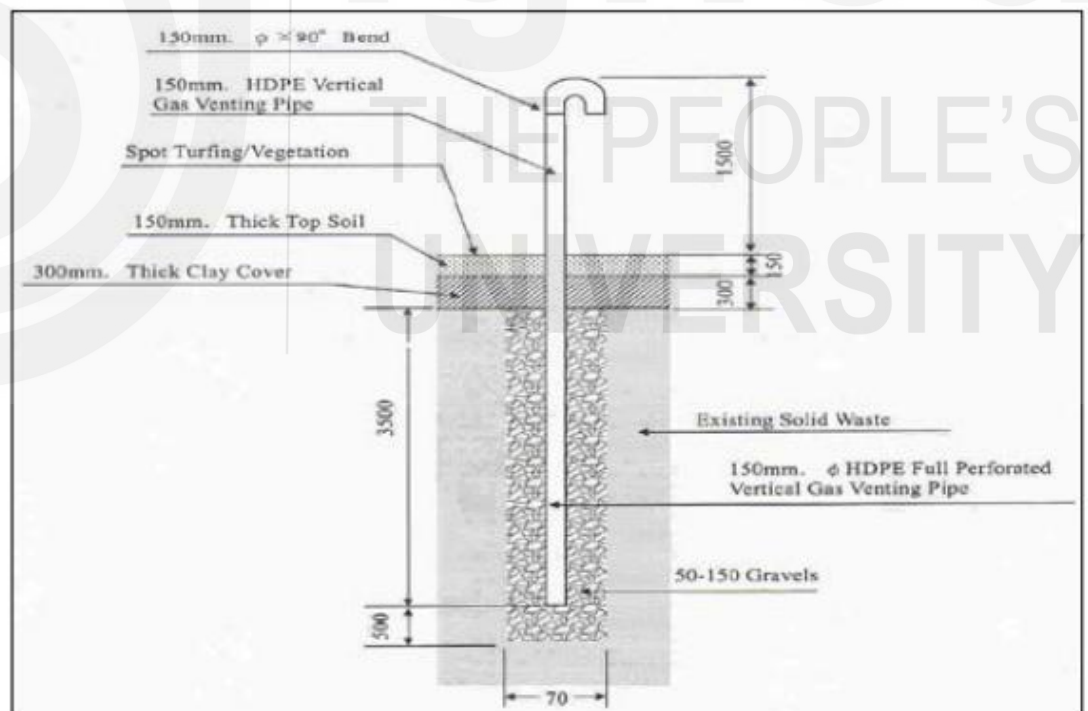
Typical Vertical Gas Venting Pipe Detail
